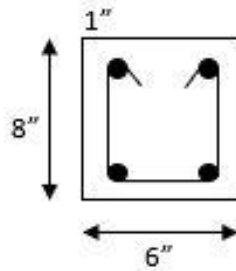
Beam cross section (Section 1-1 shown in Figure 18).
